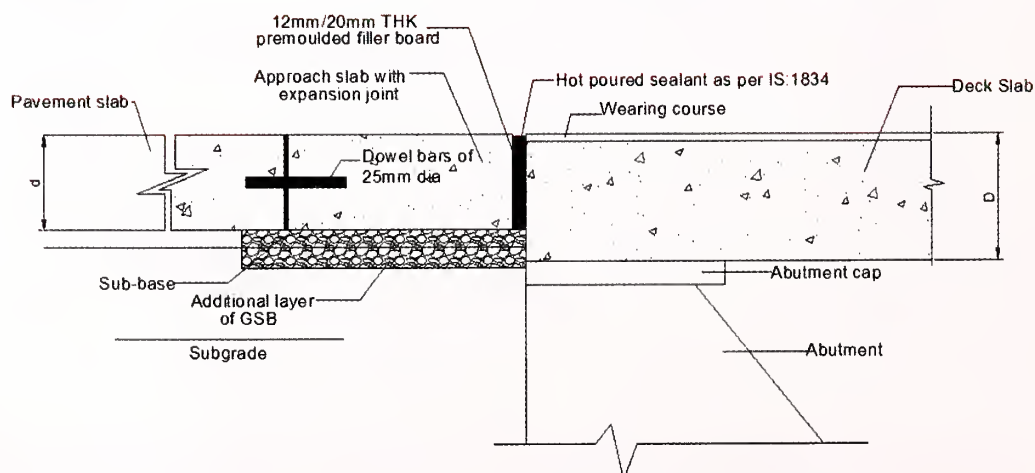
(i) Deck Slab and Expansion Joint in a Concrete Pavement
